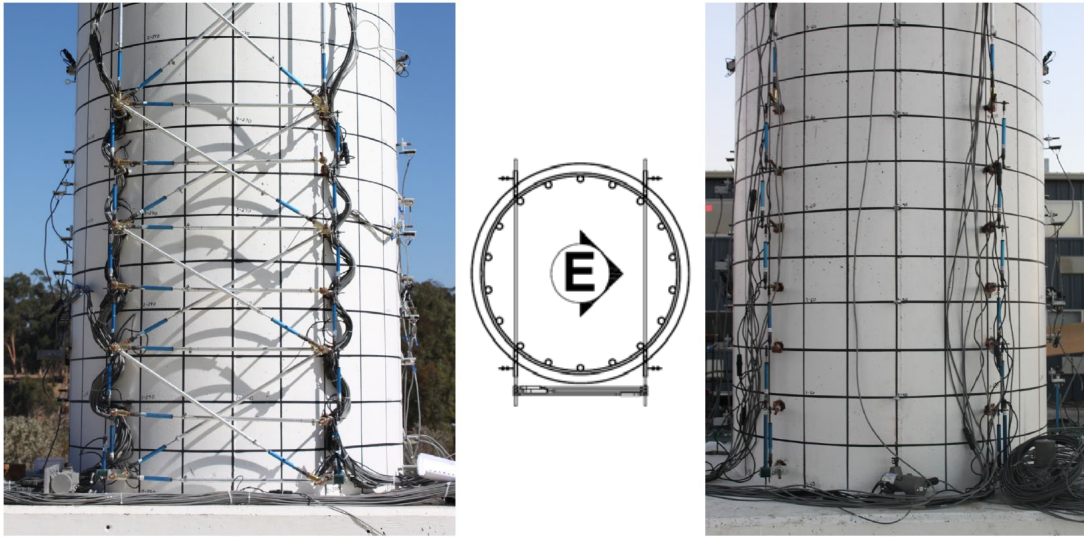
Curvature, shear, and fixed-end rotation linear potentiometers of the full-scale column: (a) Instrumented South face (b) Plan view of column and linear potentiometers; (c) Instrumented North face (Schoettler et al., 2015).
